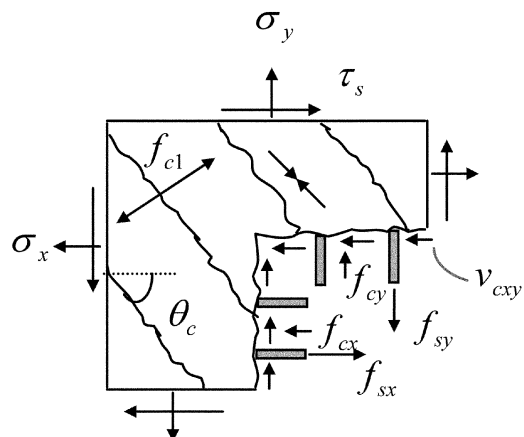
Reinforced concrete in-plane shear element showing average stresses.
